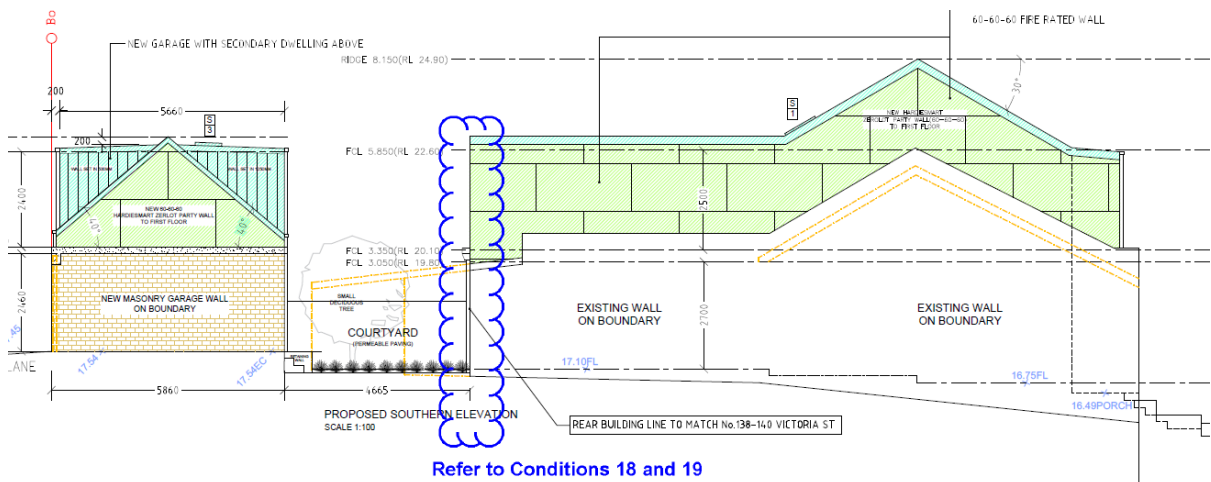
Approved side elevation of development at 134 Victoria Street (D/2021/730)
